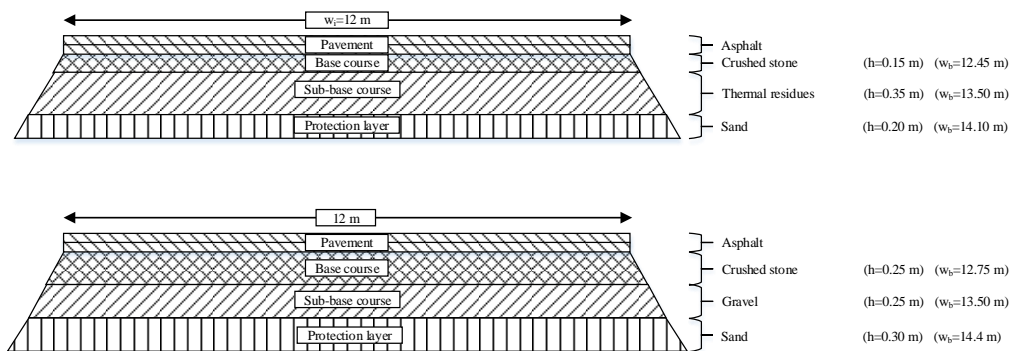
Structure of the road built from ash (top) and conventionally built road (bottom) (Eskola et al., 1999). Pavement is shown to give the initial width of the road, whereas it is not included in the study.
